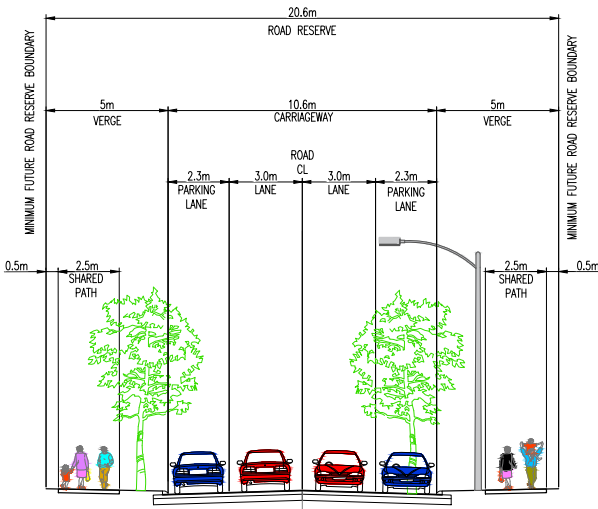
CROSS SECTION OF ACCESS STREETS B
